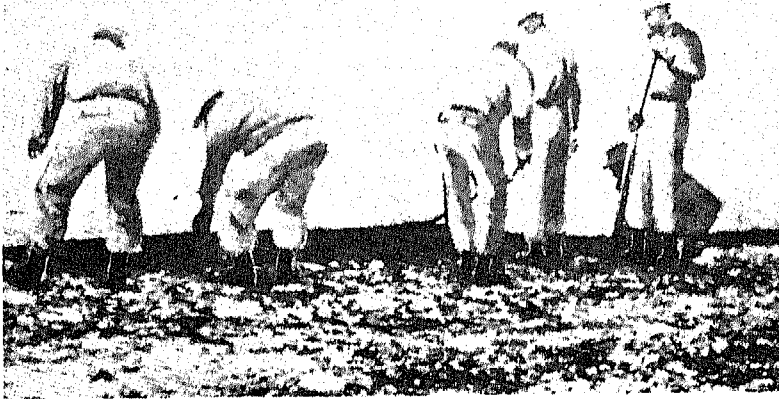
Method of anchoring plank placed on hardpan subgrade.
